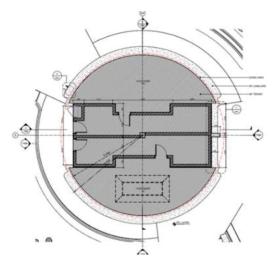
Food Court Column Architectural Plan Mall of Oman (BIM)
